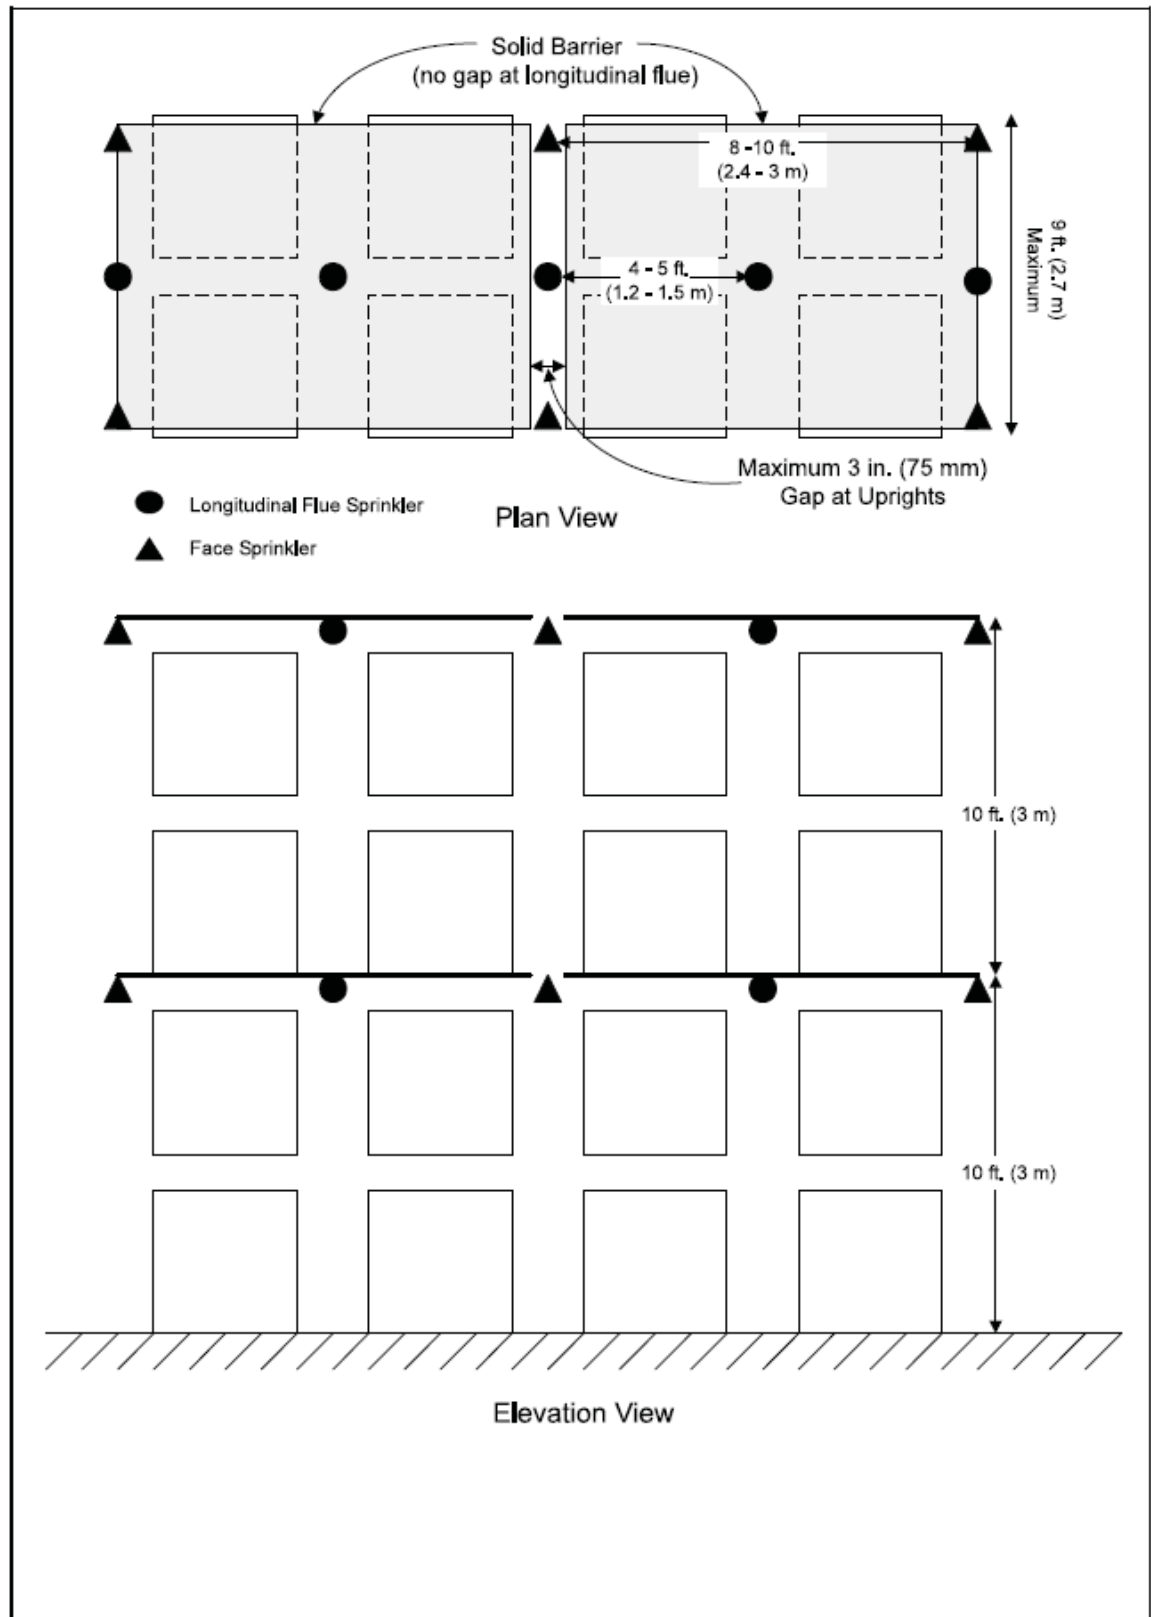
Double row rack sprinkler layout — fire protection scheme A.
